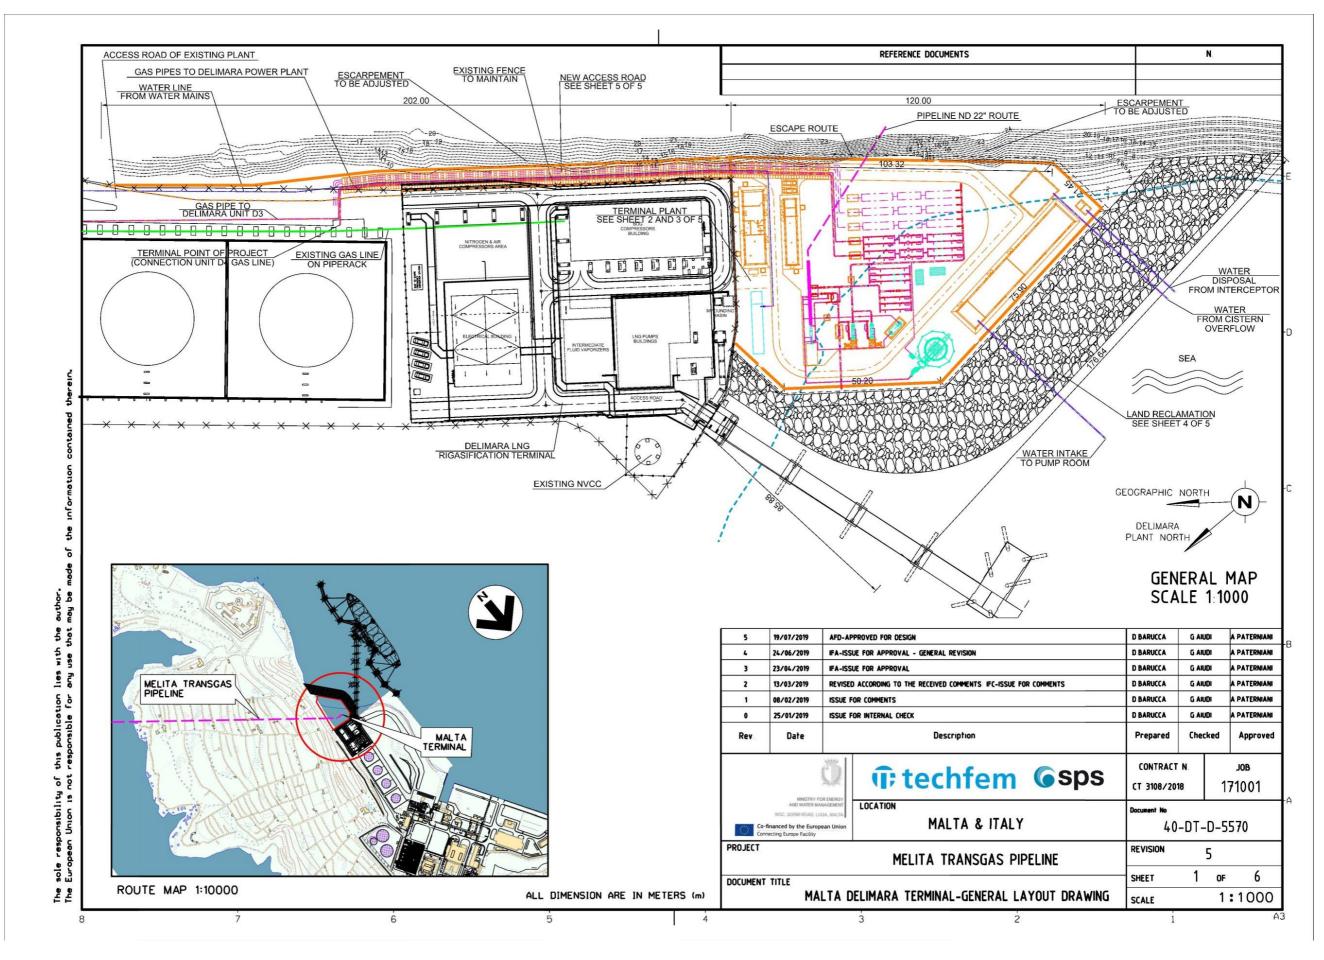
Site plan for the proposed Malta terminal and land reclamation area
